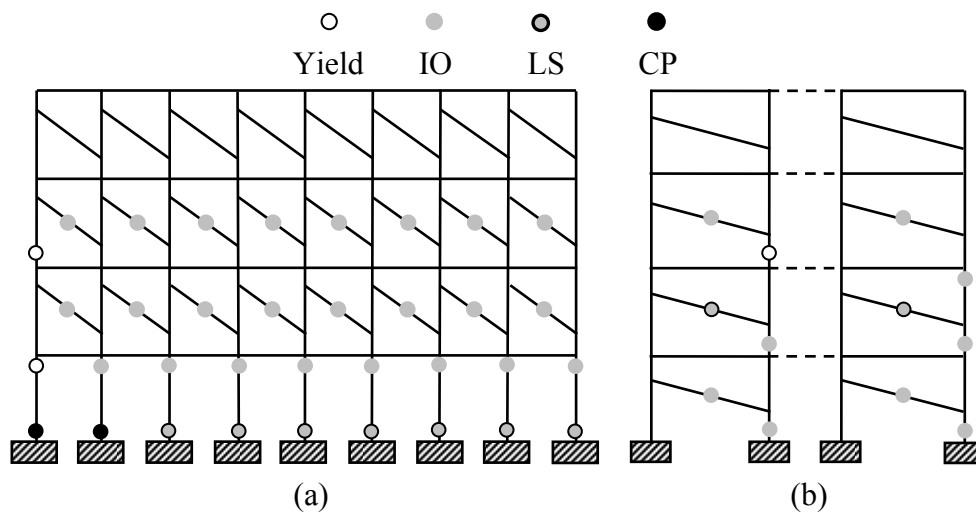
Collapse mechanism of the four storey infilled RC frame building designed as SMRF as per relevant Standards with one front bay open in ground storey: (a) open front bay in longitudinal direction; (b) typical transverse frame.
